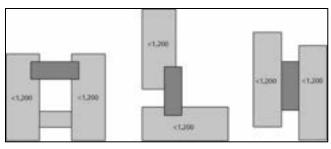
Buildings with large floor plates expressed as separate building elements
